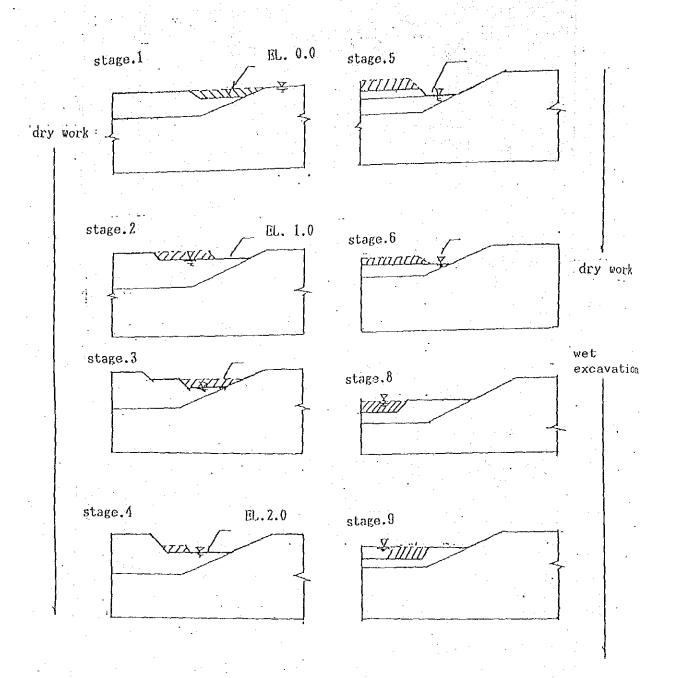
Excavation Stage and Boundary Condition of Ground Water Level (1)
